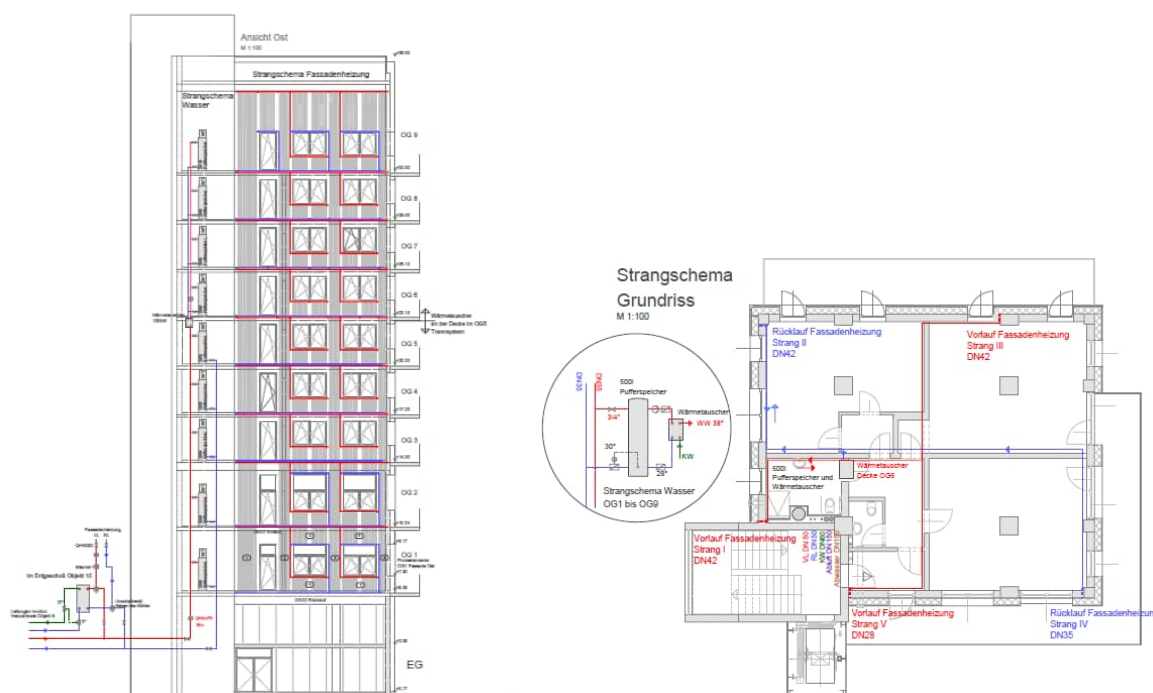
Hydraulic scheme of the energy active facade and the connection to decentralised water storage
